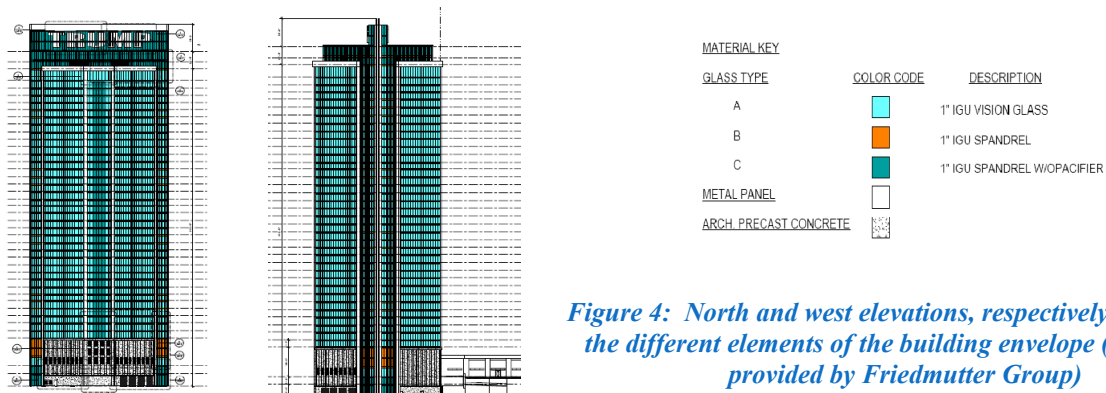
North and west elevations, respectively, illustrating the different elements of the building envelope (Elevations provided by Friedmutter Group)
